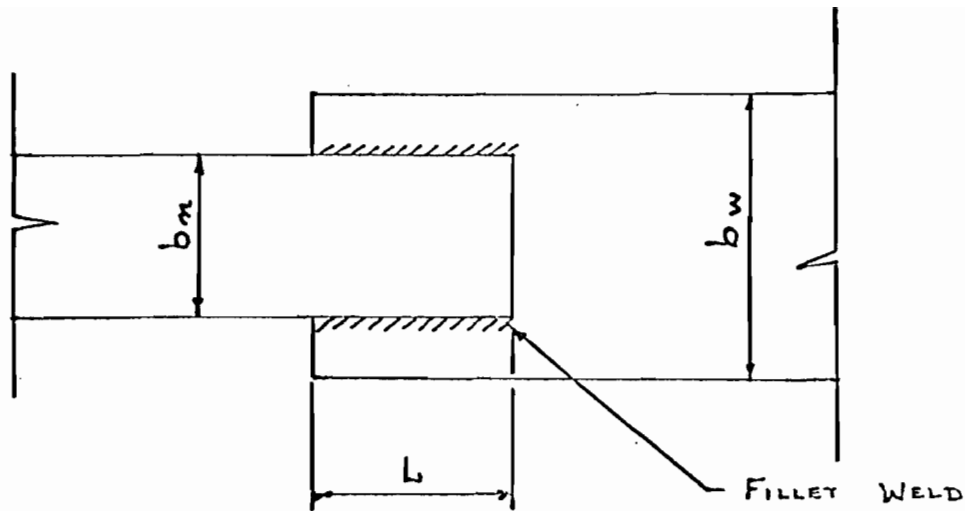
LONGITUDINAL FILLET WELD CONNECTION
